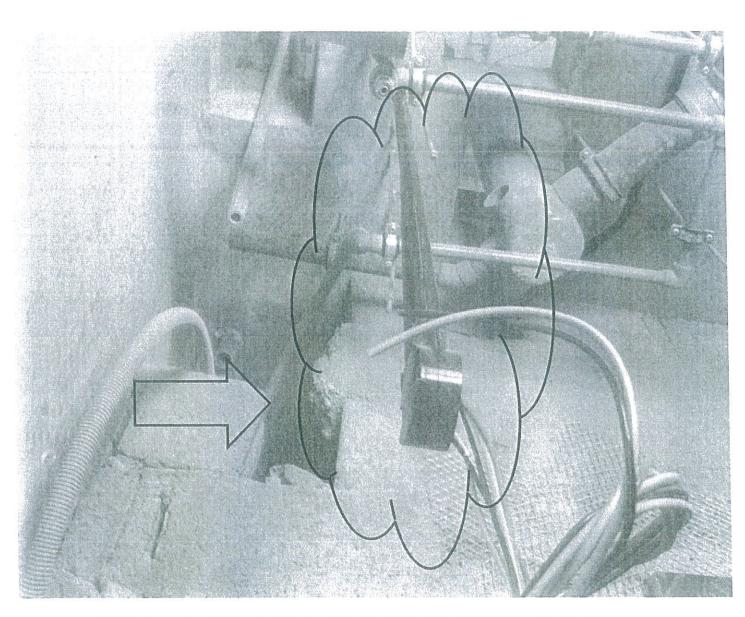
PROVISION OF CONCRETE MORTAR CEMENT COVERING PVC PIPE AND JOINT COUPLER PROTECTION FOR BREAKAGES AND DAMAGES
